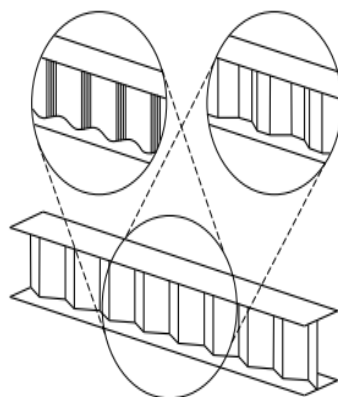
Girders with sinusoidal, trapezoidal, and triangular web
